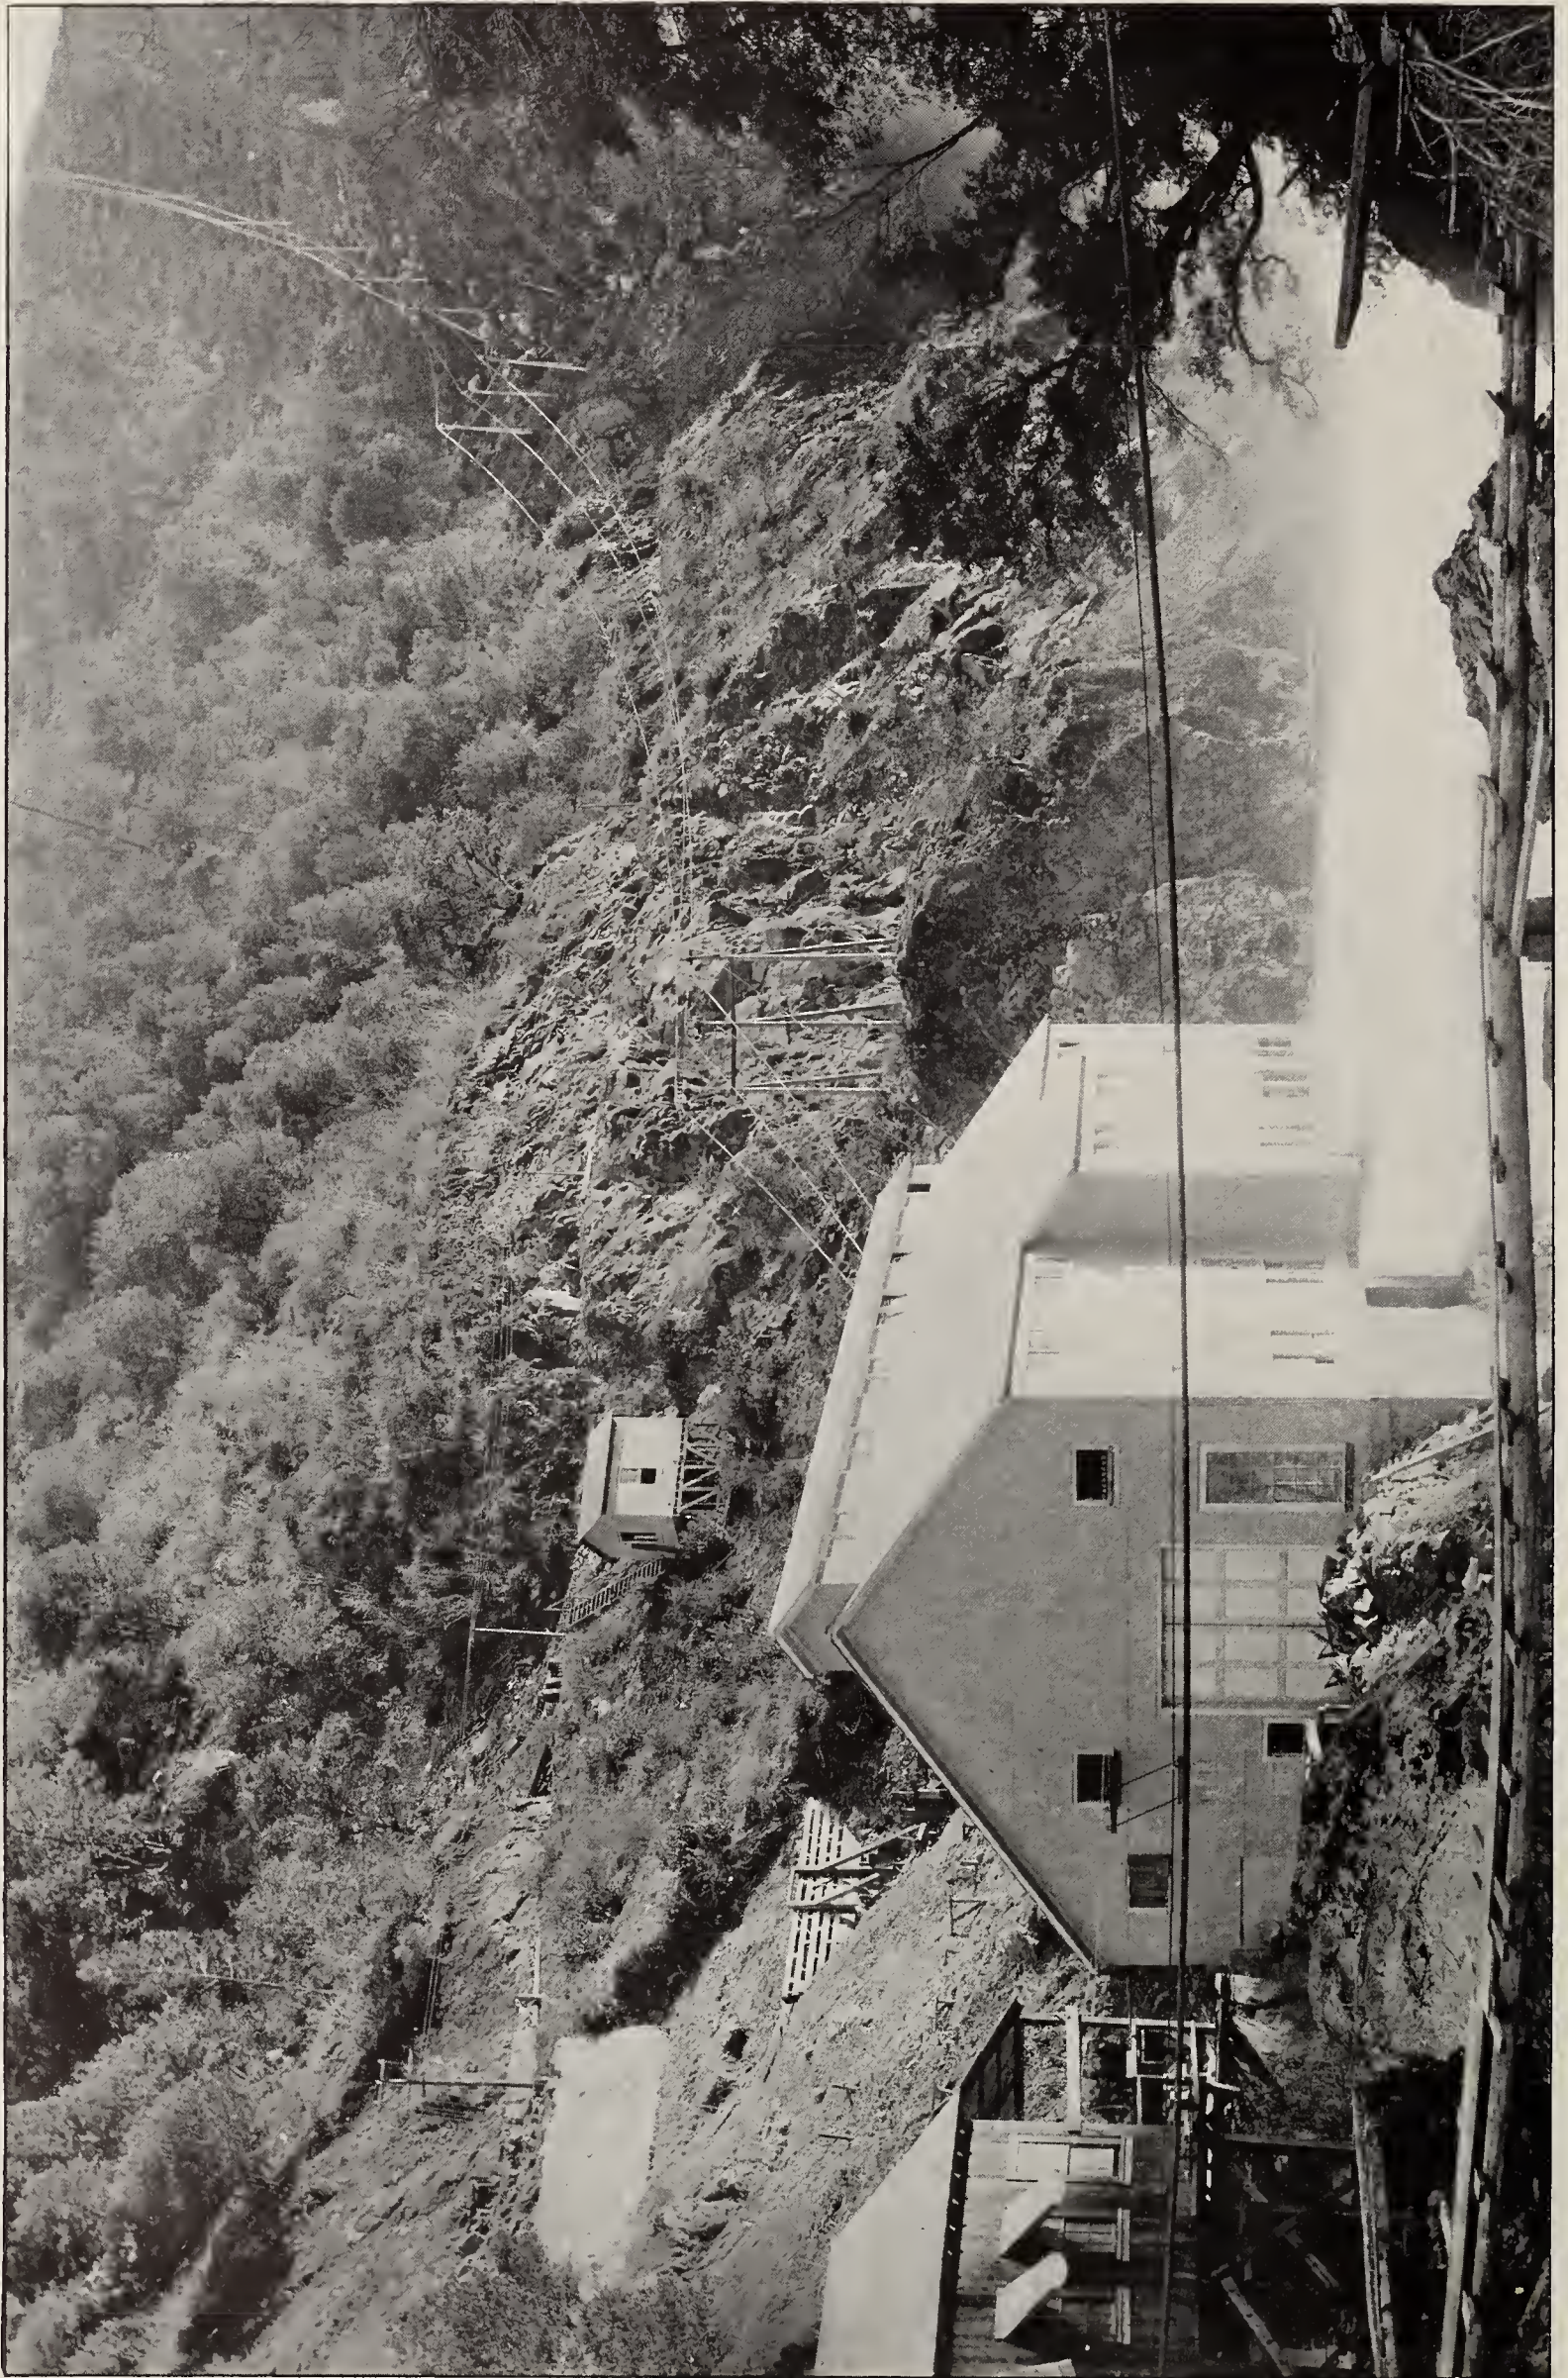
THE DE SABLE POWER HOUSE, SHOWING LONG SPANS ON 40-FOOT POLES CROSSING RAVINES
